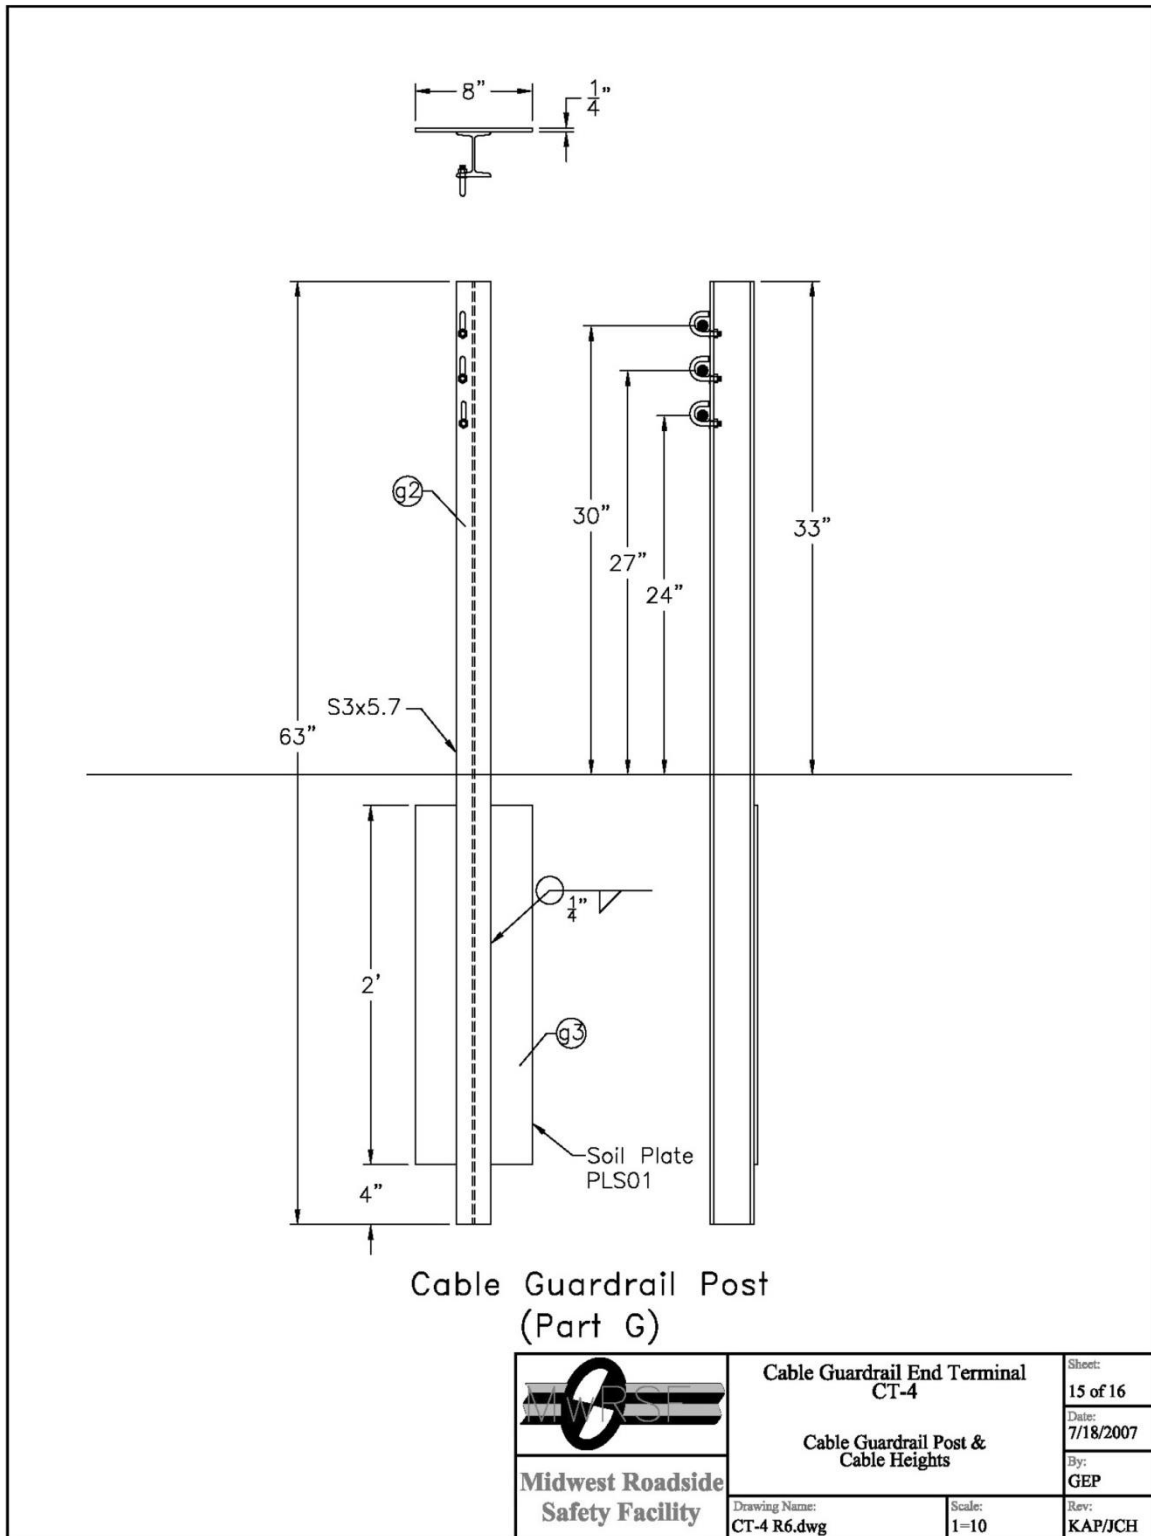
Line Post Details, Cable Terminal Testing, 2000-2007 [65]
